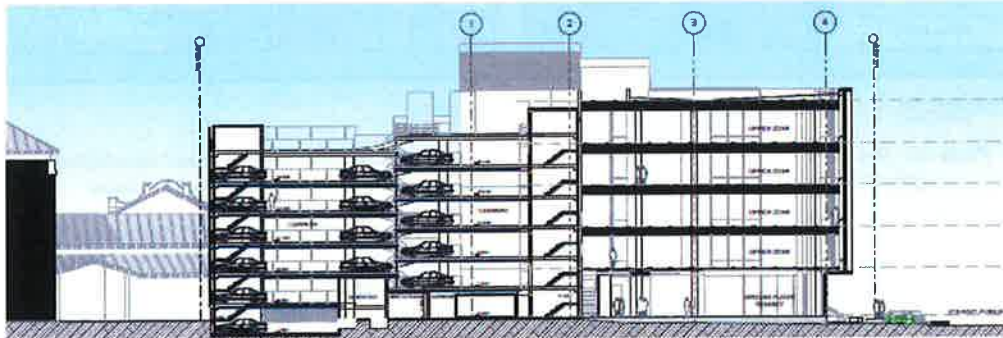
A section through the development showing the existing former Brewery buildings and the proposed Car Park structure with the office building on Stewart Ave. (Source – PTW CKDS Architects in Association)
